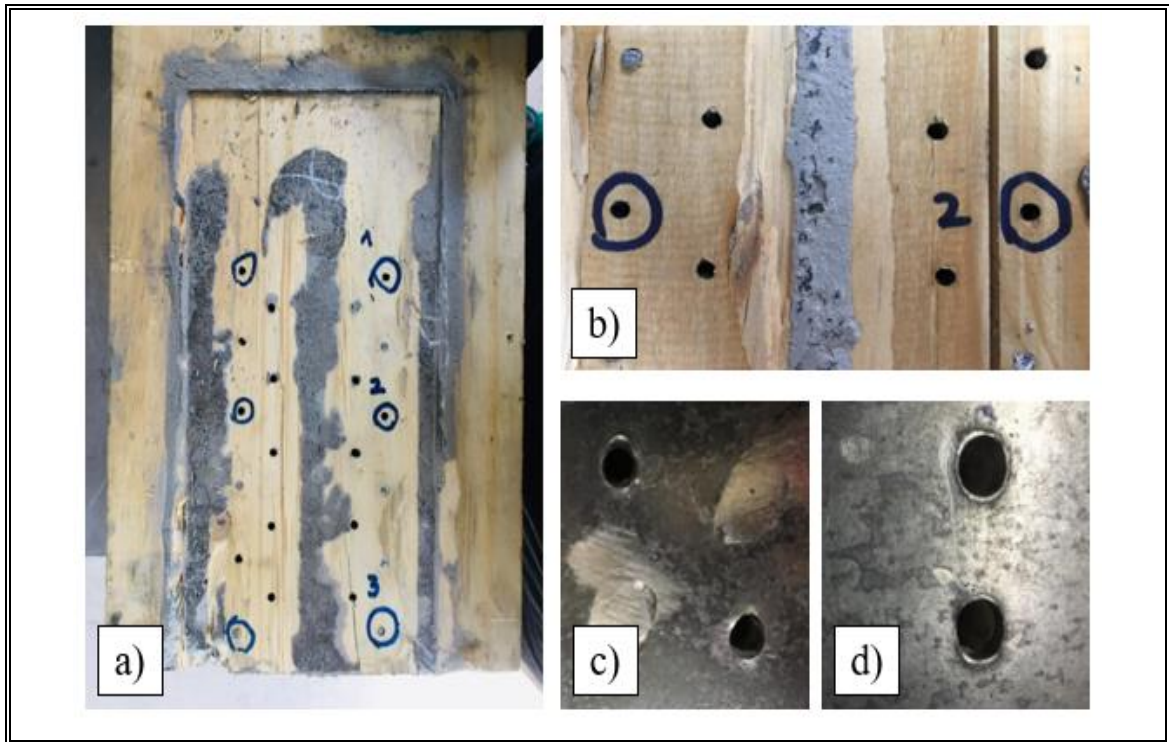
Crushing on HDG components: a) Perforations in the wood behind the epoxy bonded plate; b) Drill hole zoom on timber element; c) Crushing of steel plate for nailed specimens; d) Crushing of steel plate for bolted specimens
